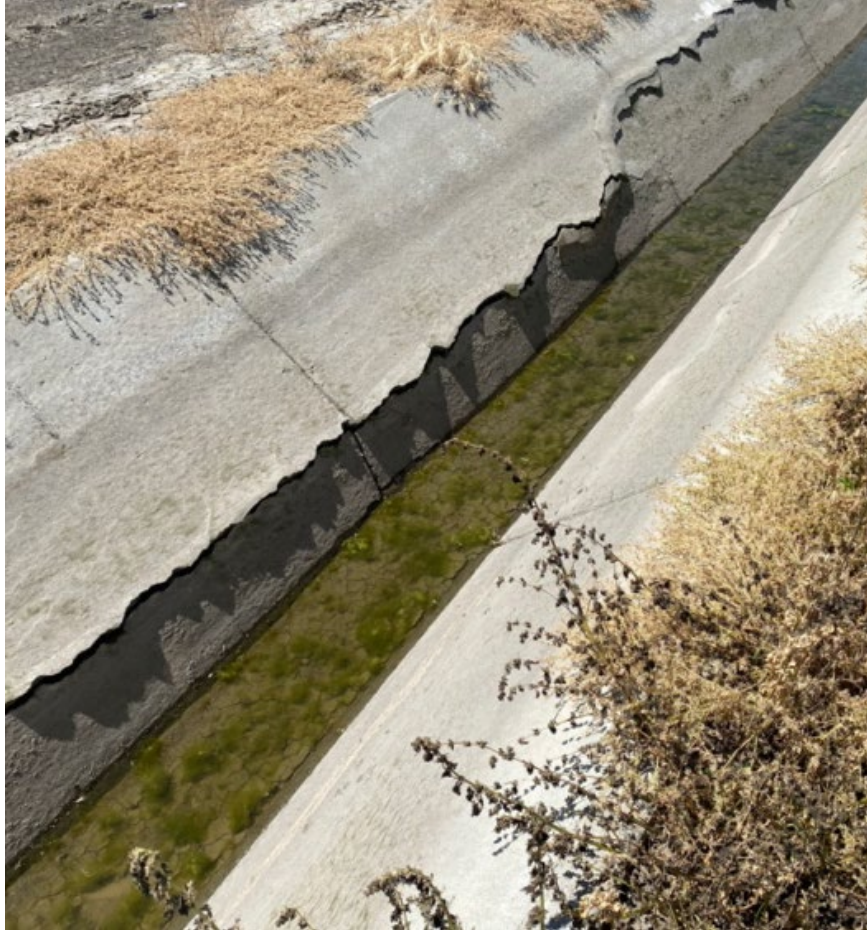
Typical condition of the existing concrete canal installed in 2004 prior to remediation efforts.
